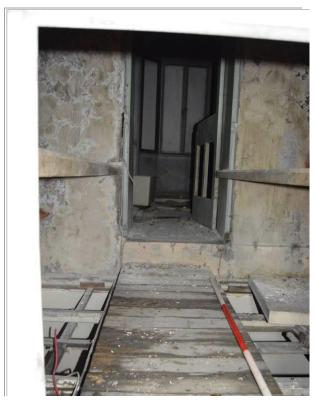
Walkway to access room S2. Scale 2m. Facing north west.
